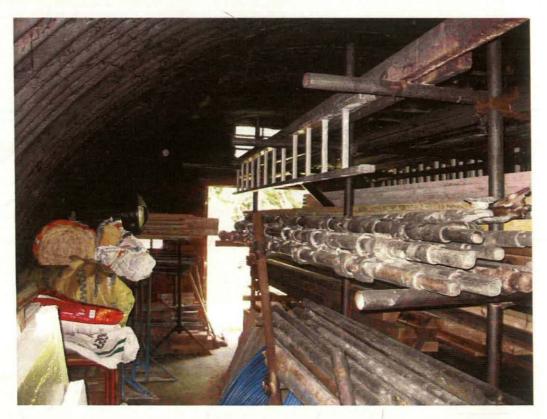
Interior of Room 1 of Nissen hut, view toward door, looking west
